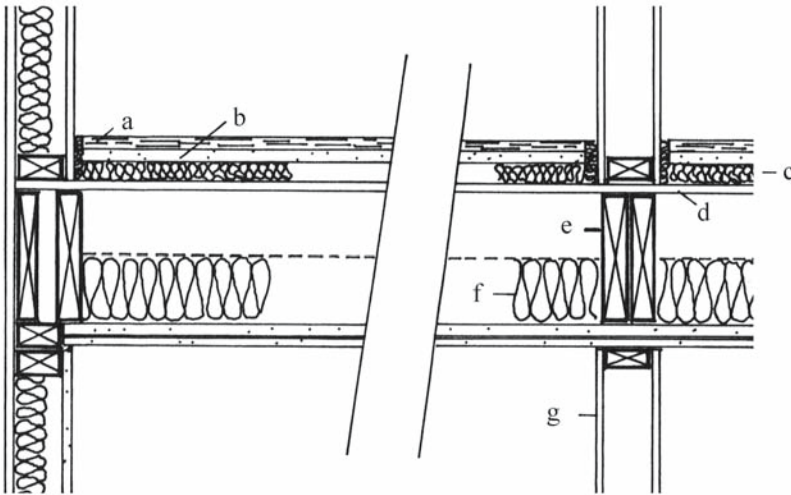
Section through a timber platform floating floor. *a* 18-mm tongue and groove chip-board; *b* 19-mm plasterboard; *c* 25-mm mineral wool, 64 kg/m²; *d* 12-mm tongue and groove plywood; *e* floor joist; *f* 10-mm mineral wool, 12 kg/m³; *g* 12.5-mm plasterboard. (Fothergill and Royle 1991, by permission of the controller of HMSO, British Crown copyright)
